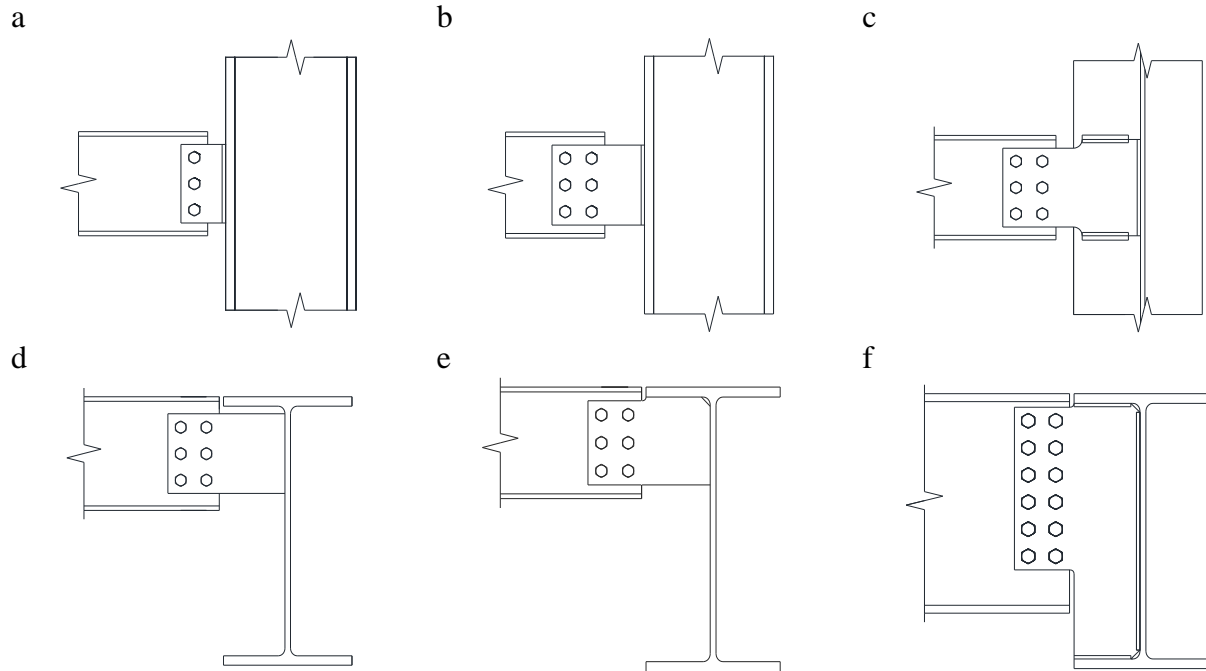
Shear tab connections: a) Conventional beam-to-column shear tab connection, b) Extended beam-to-column shear tab connection, c) Extended beam-to-column shear tab (stiffened), d) Extended beam-to-column shear tab (unstiffened), e) Extended beam-to-girder shear tab (partial depth-stiffened), f) Extended beam-to-girder shear tab connection (full depth-stiffened)
